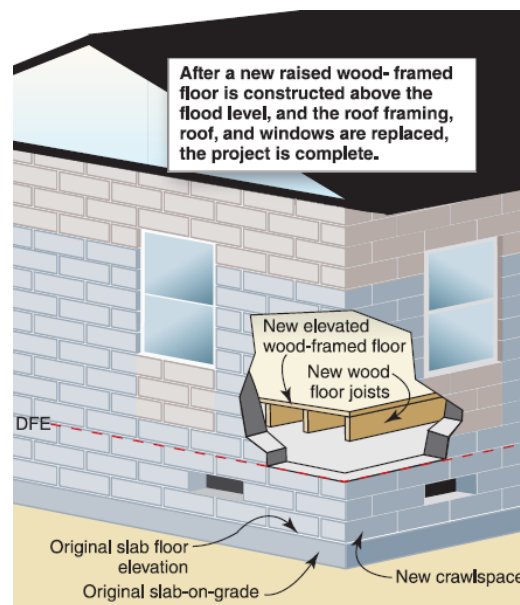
A new first floor is built above the design flood elevation (FEMA)
